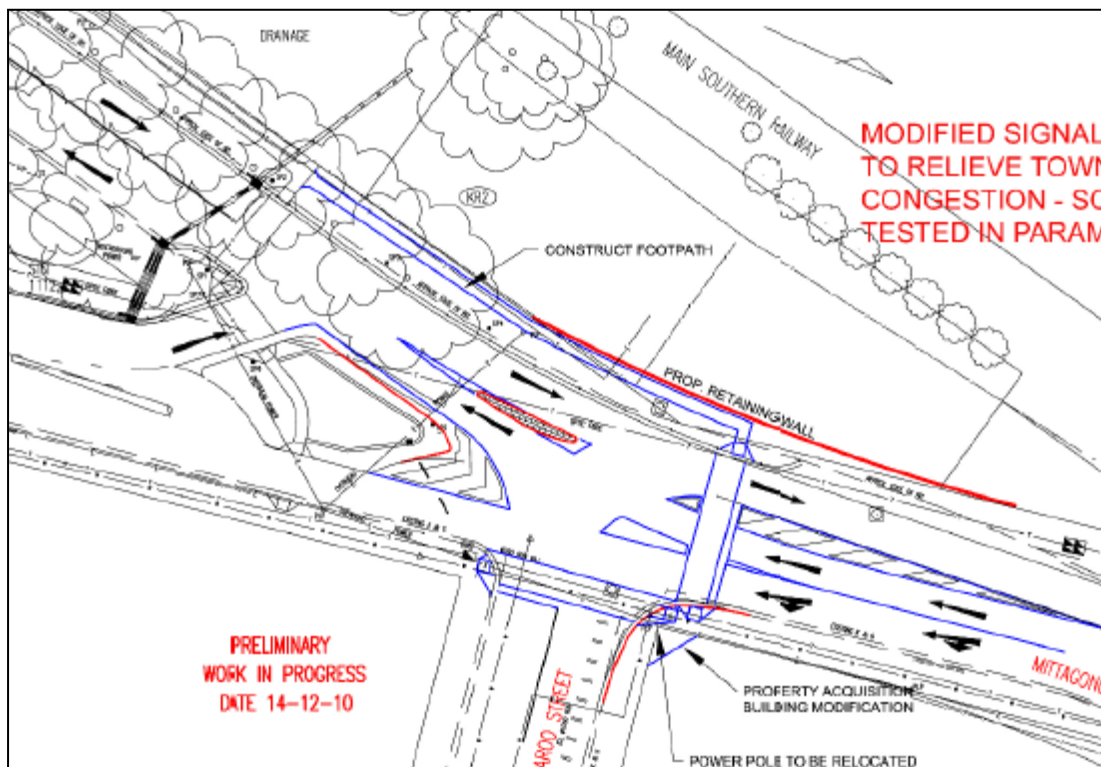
Preliminary layout of proposed reconfiguration of the intersection of Bong Bong Street and Bundaroo Street
